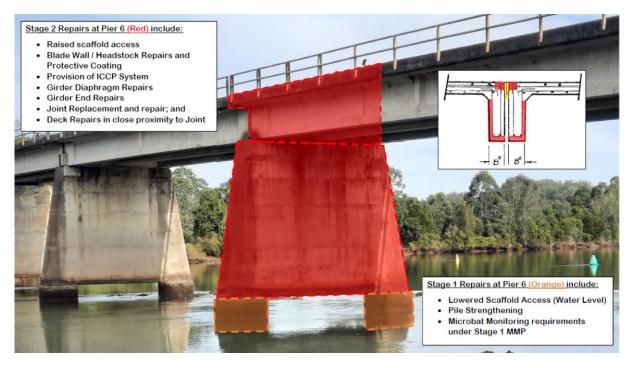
Staged works on Pier 6 Rawdon Island Bridge – Stage 2 works (this proposal) shown in red (source: PMHC)
